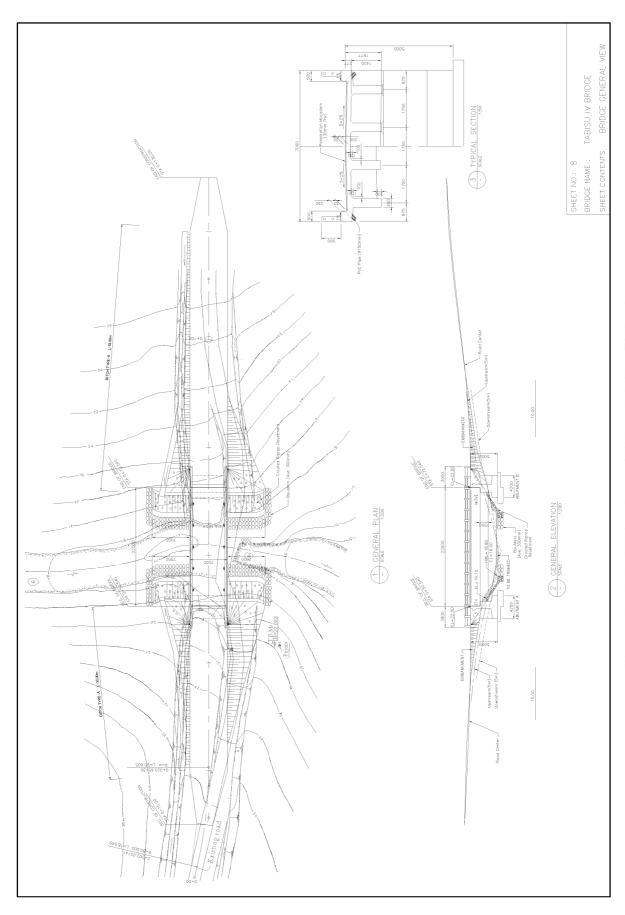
Bridge General View of TabisuIV Bridge
